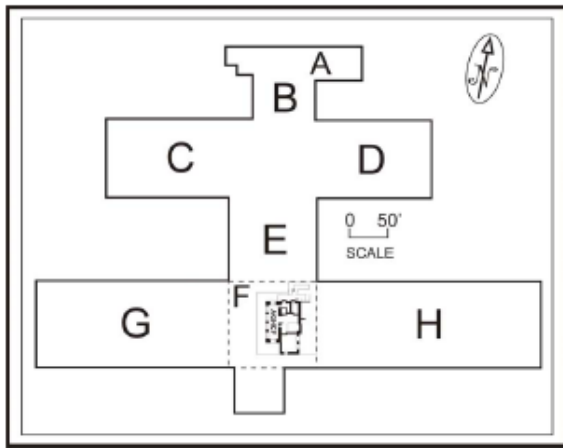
, MRB Schematic Layout, showing location of F Wing and FSMHF
